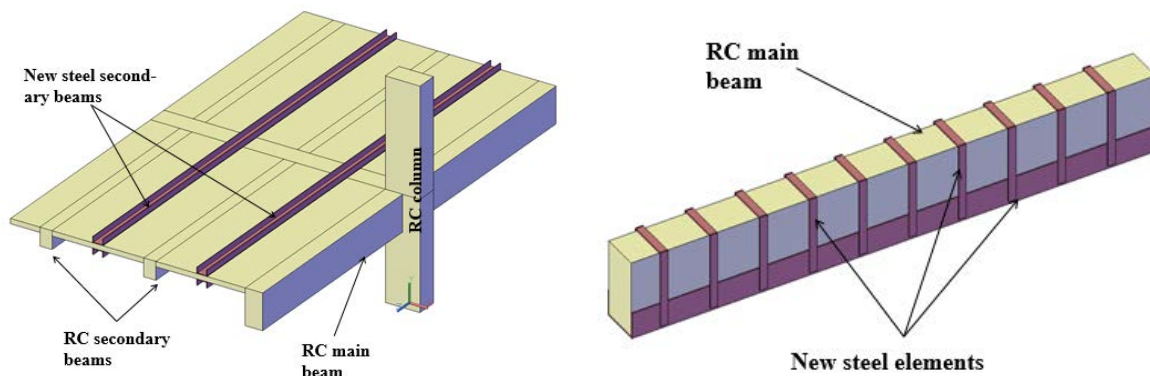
Strengthening of the 3rd and 4th storey: slab (left) and main RC beam (right)
